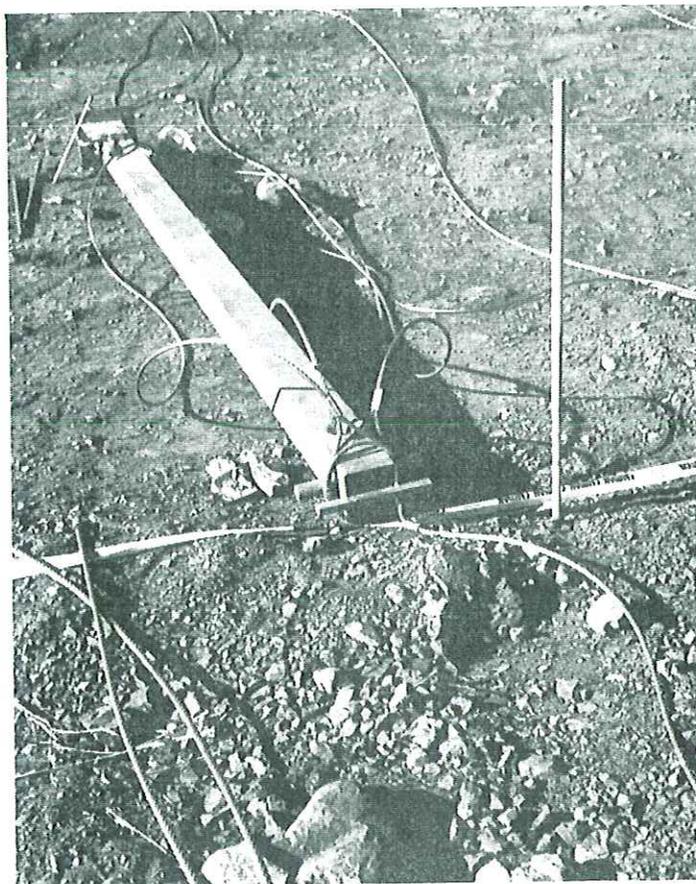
INDUSTRIAL ENTERPRISE 5 1/2-x5 1/2 -INCH GALVANIZED STEEL BOX POST WITH GUY WIRES
